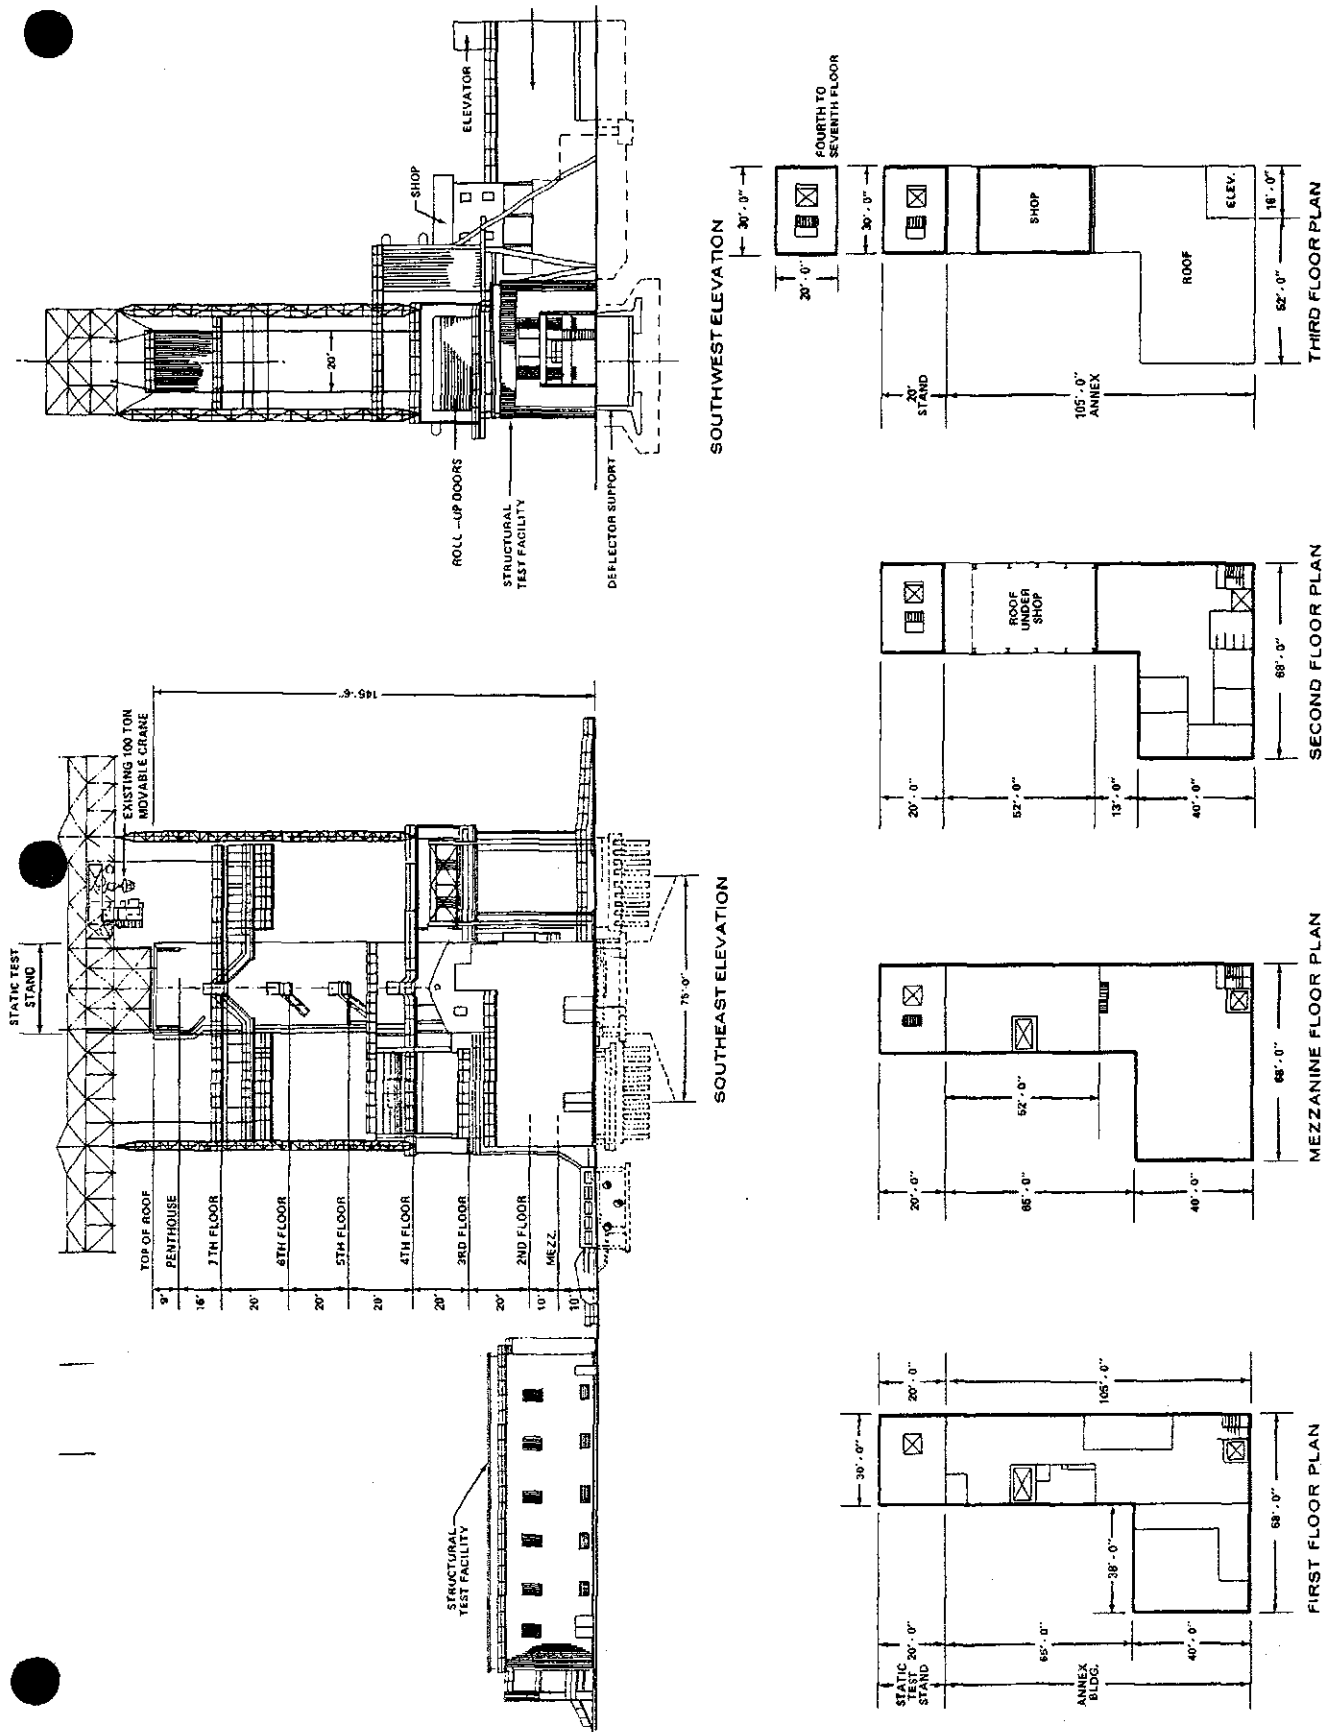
Elevation and plan drawings of the Solid Rocket Motor Propulsion and Structural Test Facility (Building 4572) at NASA's Marshall Space Flight Center. (Source: Master Planning Office, Marshall Space Flight Center)
